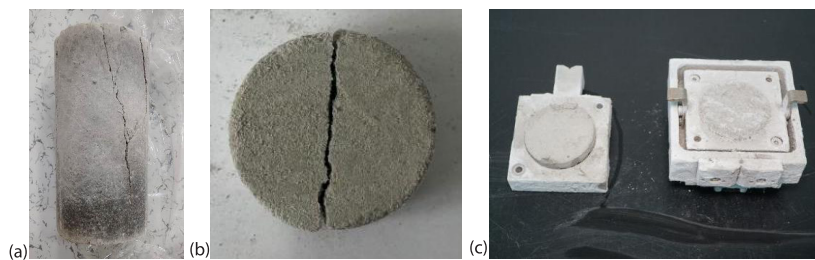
Failure modes of the specimens; (a) compression failure, (b) Brazilian splitting failure, and (c) shear failure
